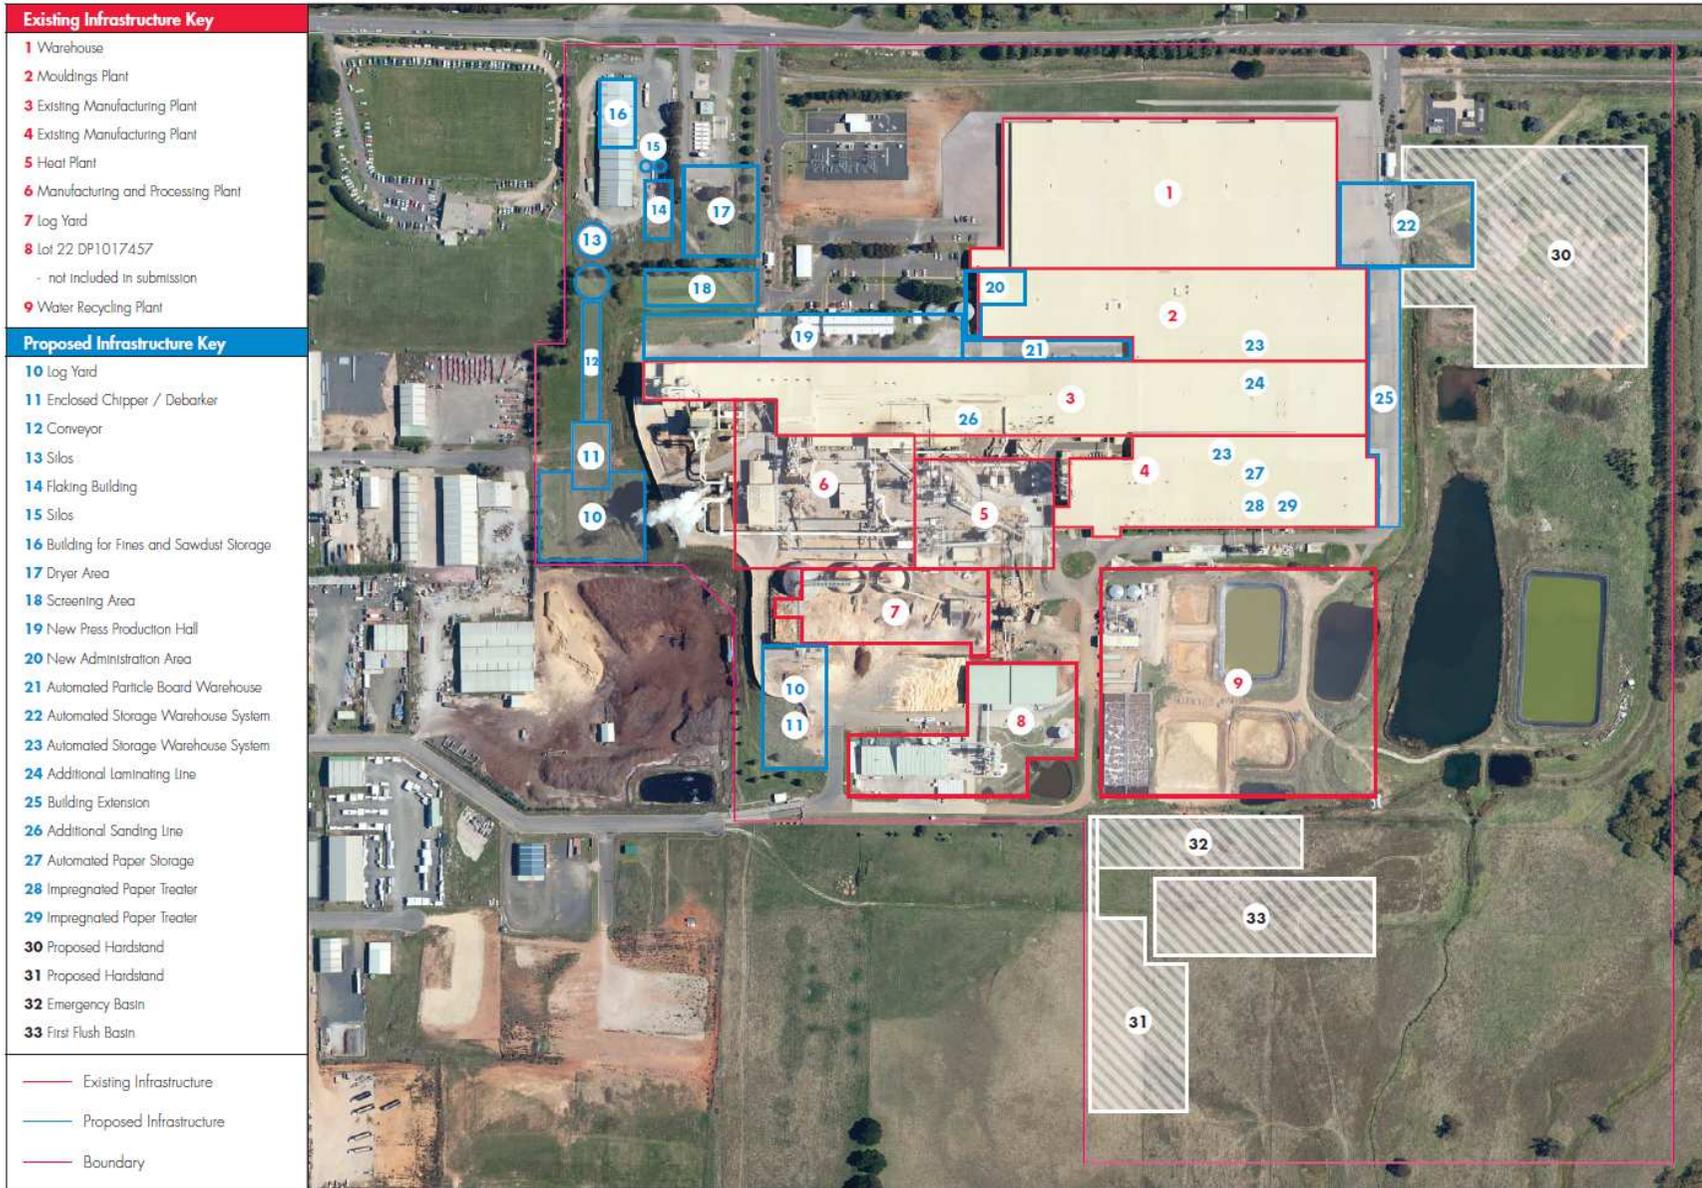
Existing and proposed infrastructure (Source: Borg Construction, 5 May 2016)
